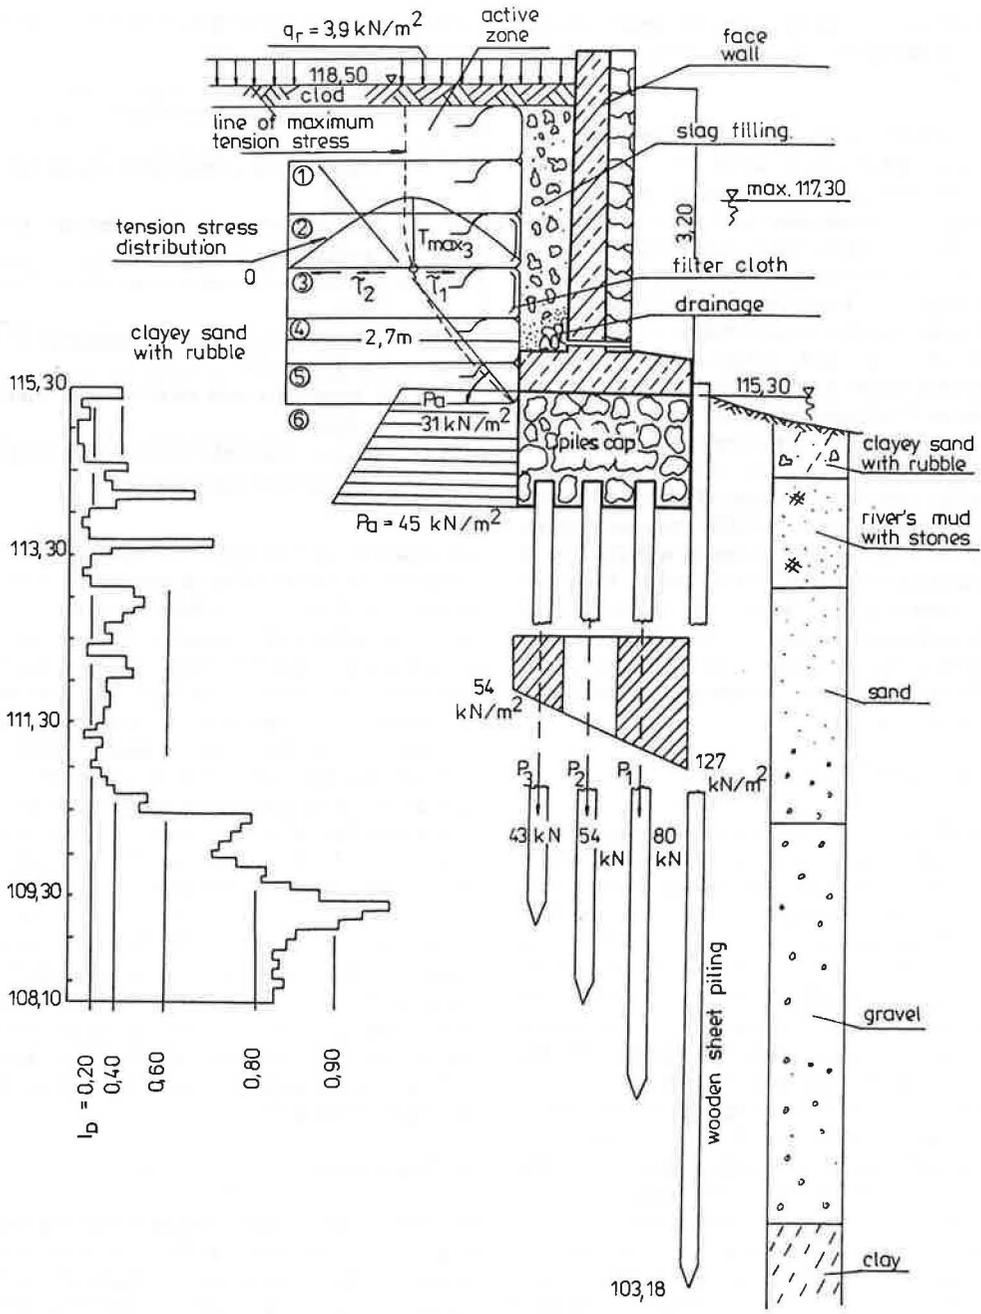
Cross-section of the embankment wall with reinforced earth relief structure
